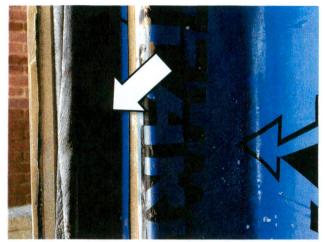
2-inch clips are used to secure the windows to the wood blocking.
